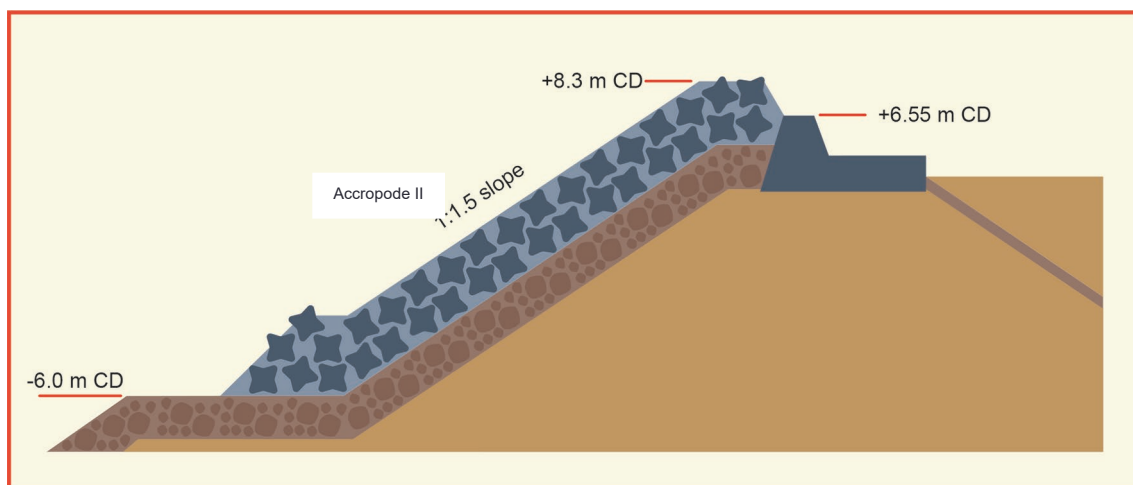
Typical cross-section of a breakwater with concrete armour – Case Study 8
